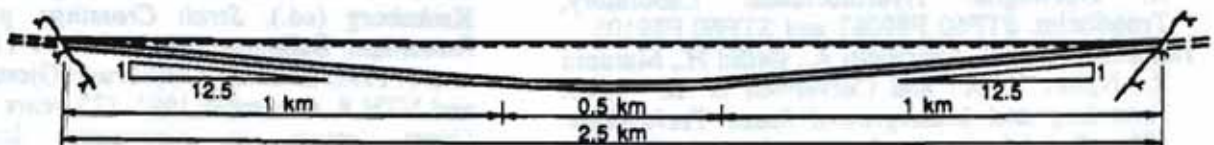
Cross-section of fiord with tubular bridge spanning 2.5 km.
